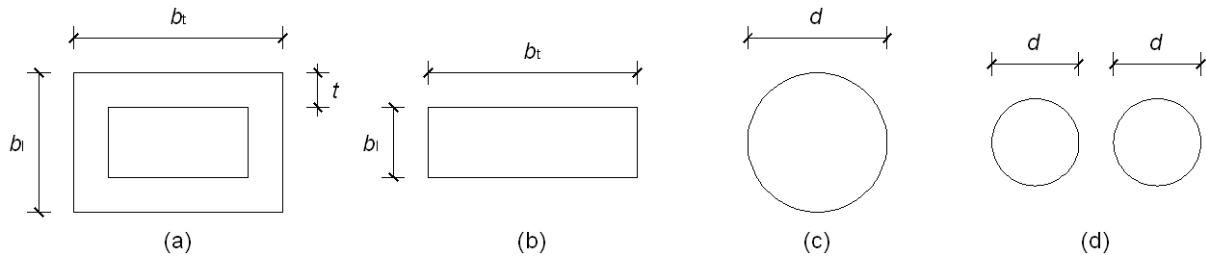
Pier cross-sections: rectangular hollow (a), wall-type (b), circular (c) and two-column circular (d)
